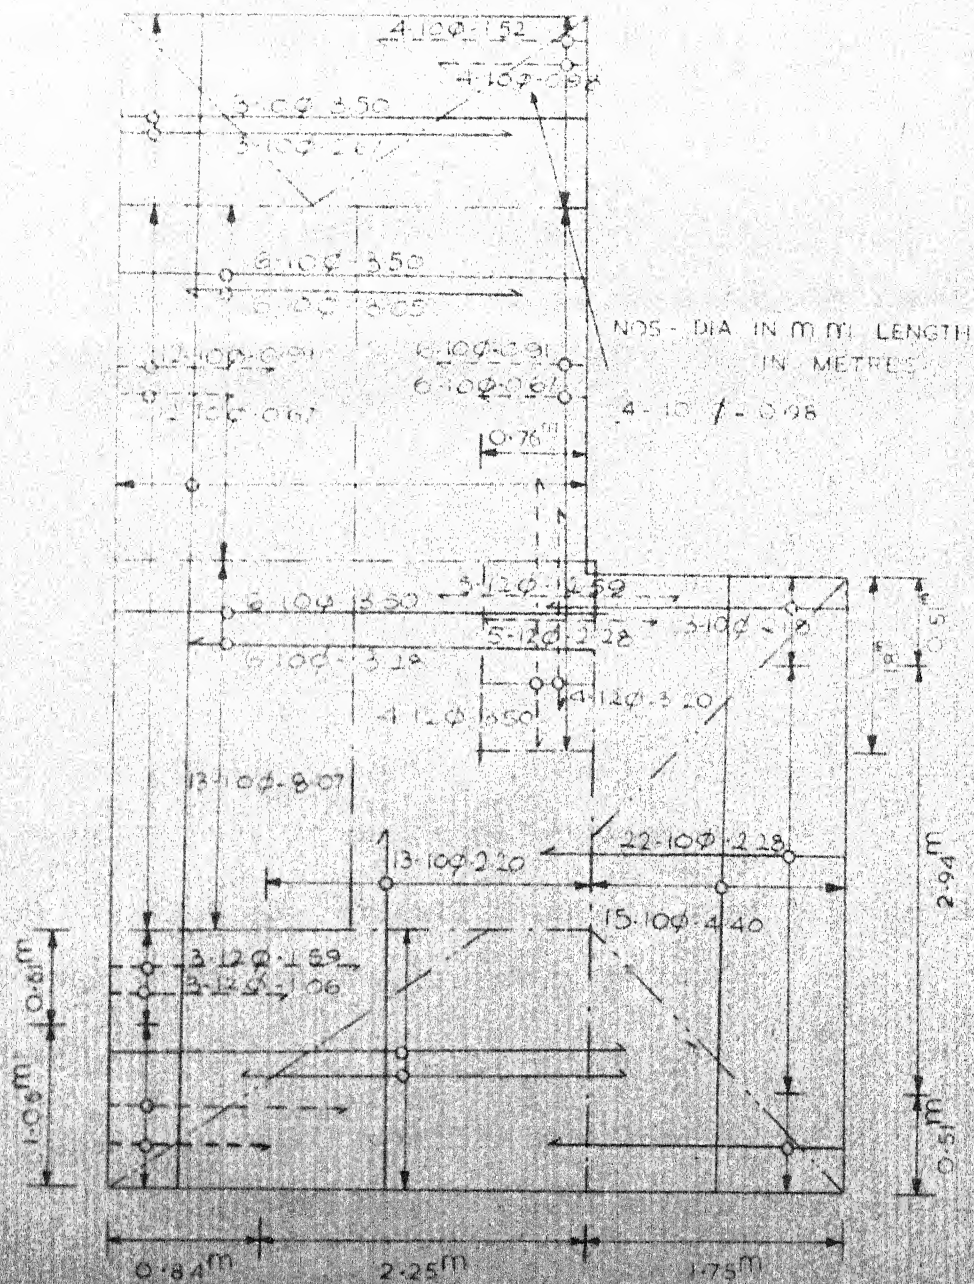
REINFORCEMENT LAYOUT FOR THE L-SHAPED SLAB.
